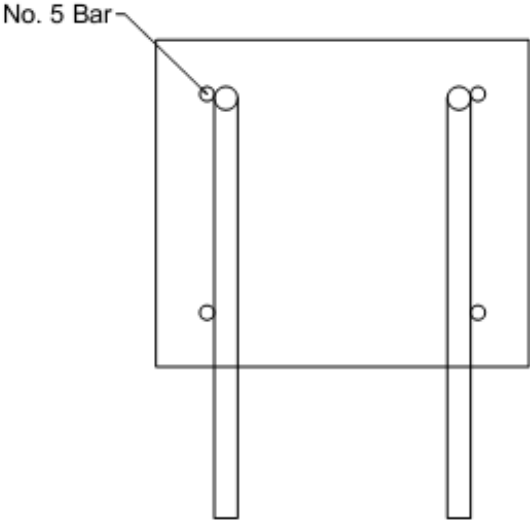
Longitudinal column reinforcement-4 No. 5 bars. Transverse reinforcement not shown.
